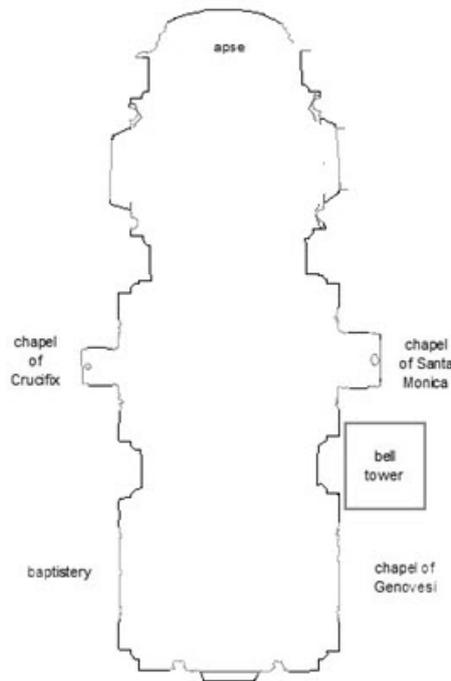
Floor plan of the church with the relevant positions of its characteristic elements.
